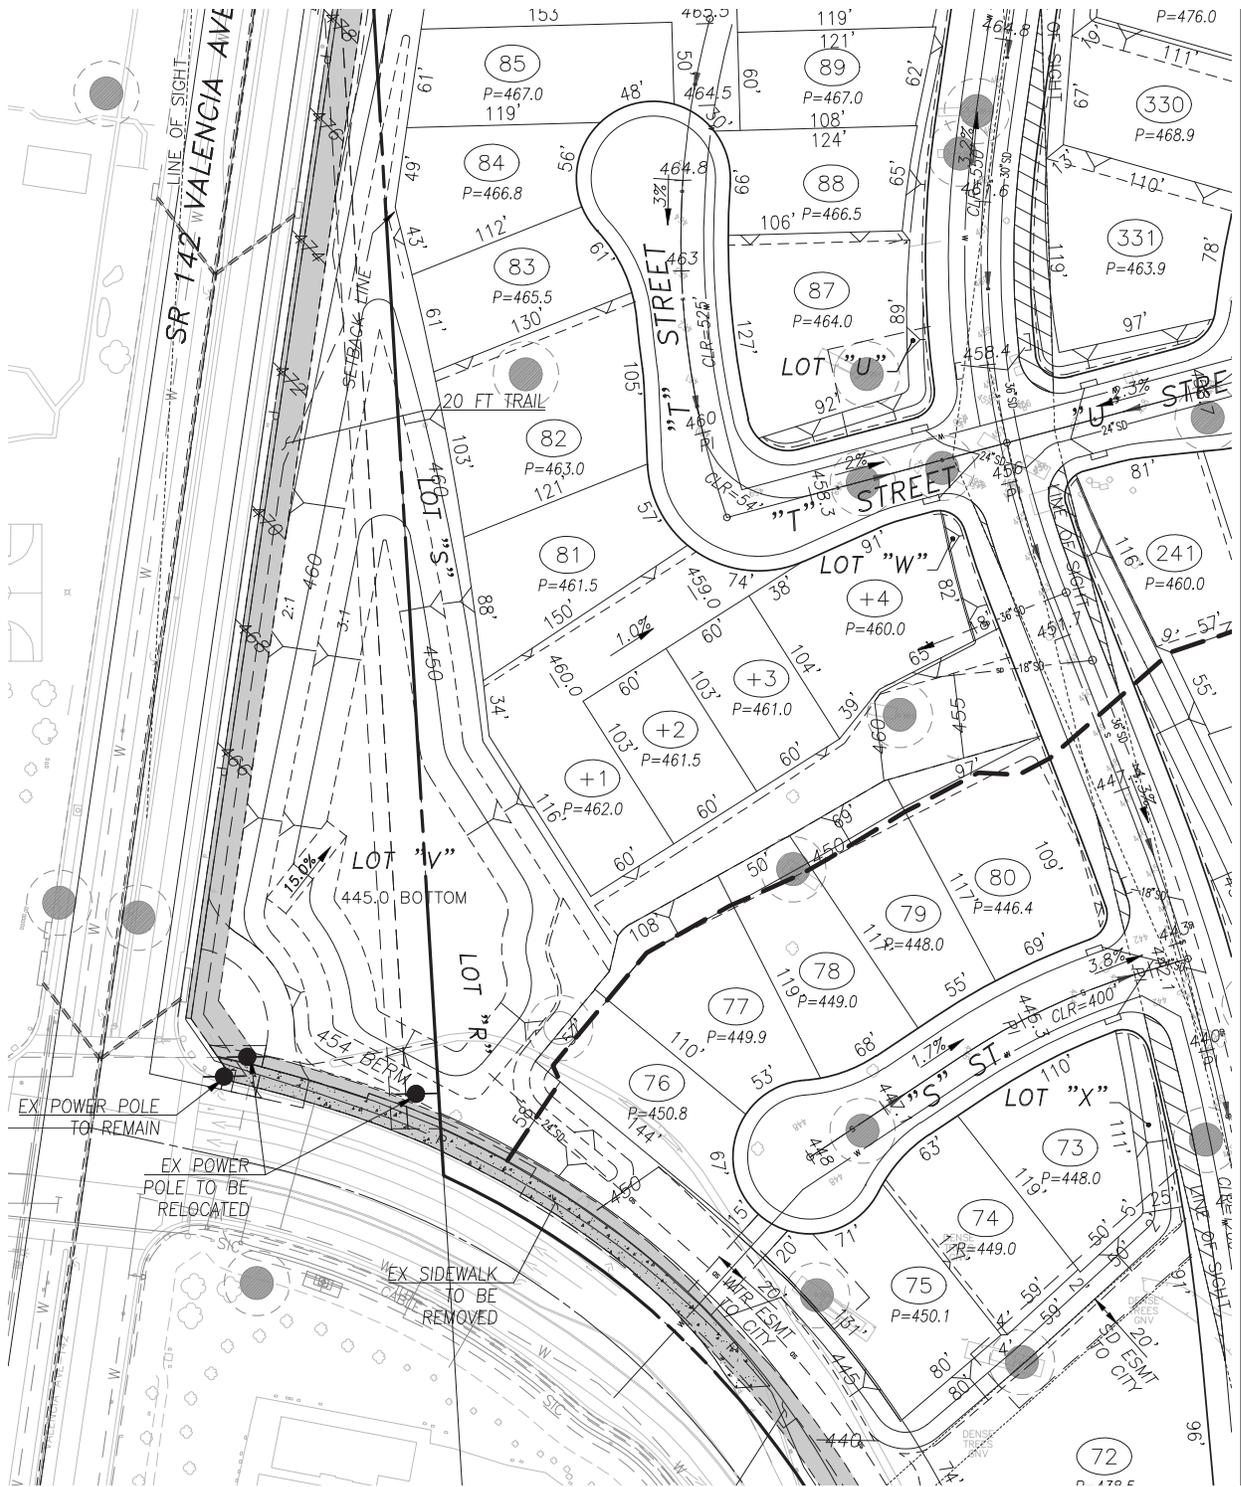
A, CONCEPTUAL GRADING PLAN- WEST PARCEL
